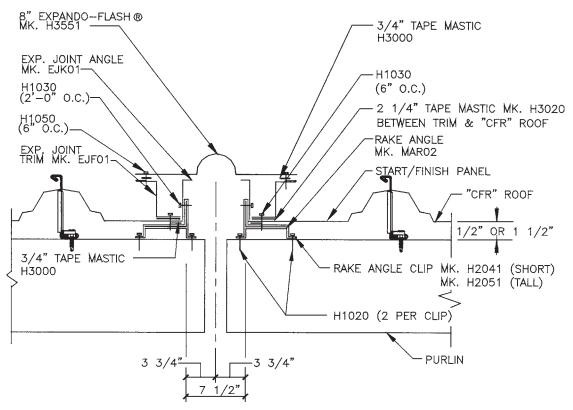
Details of expansion joint in building with structural roofing with trapezoidal profile. (Nucor Building Systems.)
